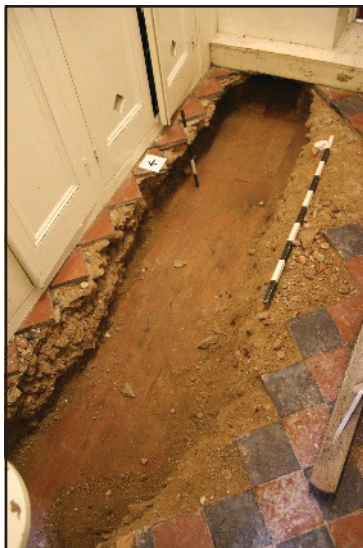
The red brick floor beneath the later tiled floor in the Scullery, Epperstone Manor House, viewed looking south-east
